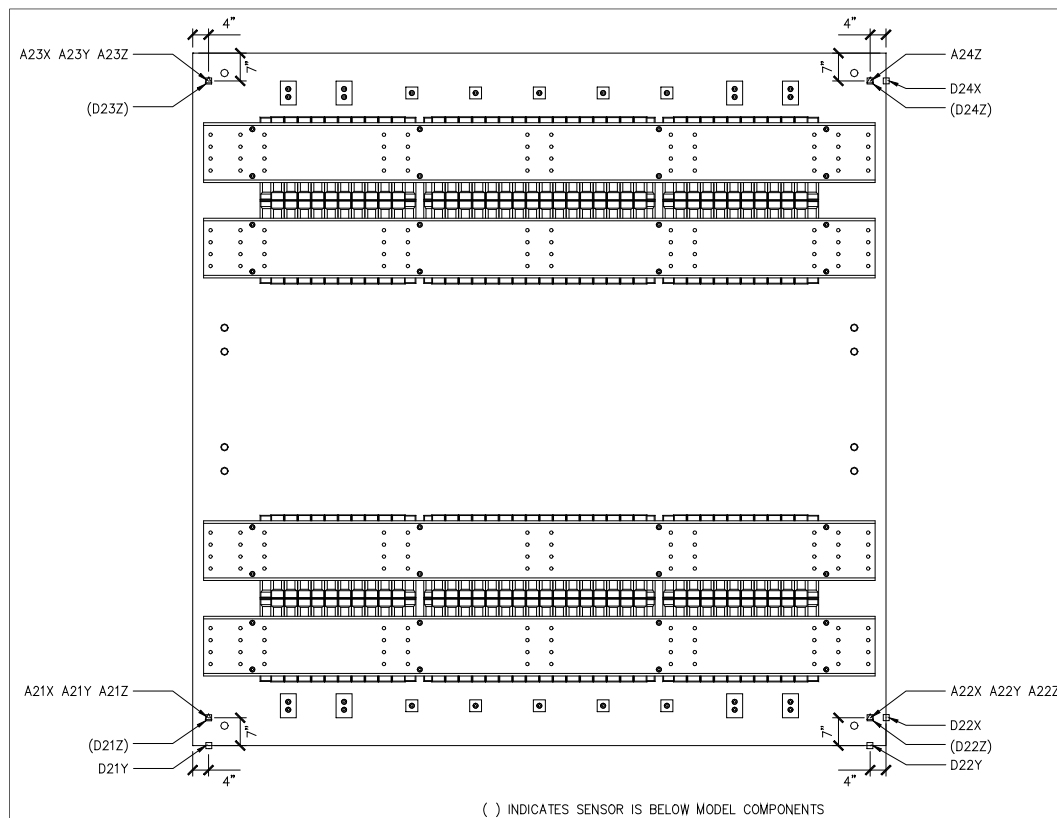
Plan view of the second-story slab showing instrumentation.
